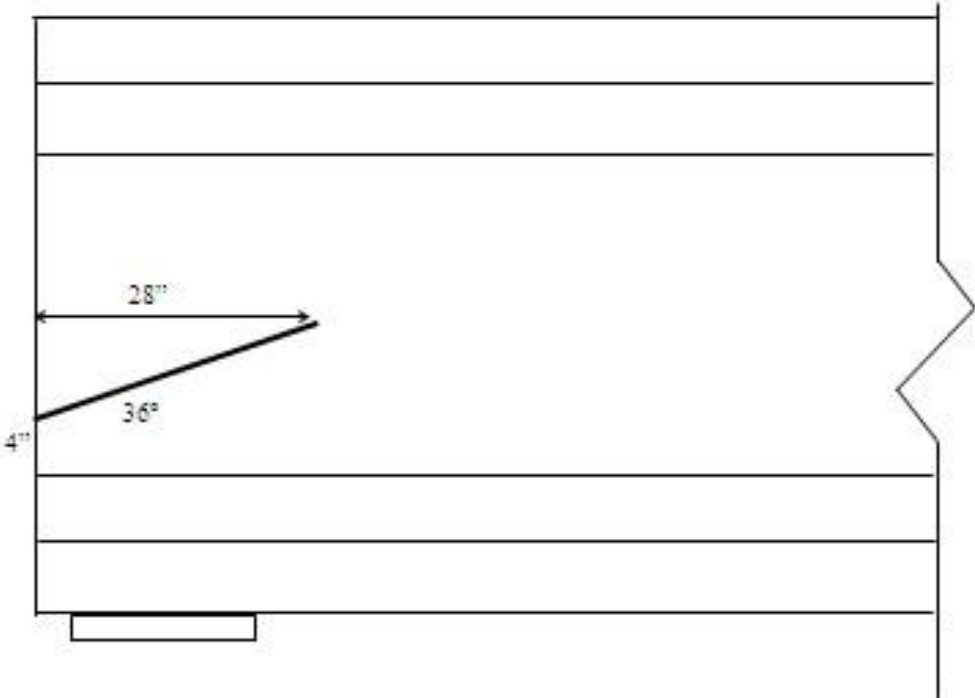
Crack diagram for girder 3rd from east side, west face, north abutment (#1830).
